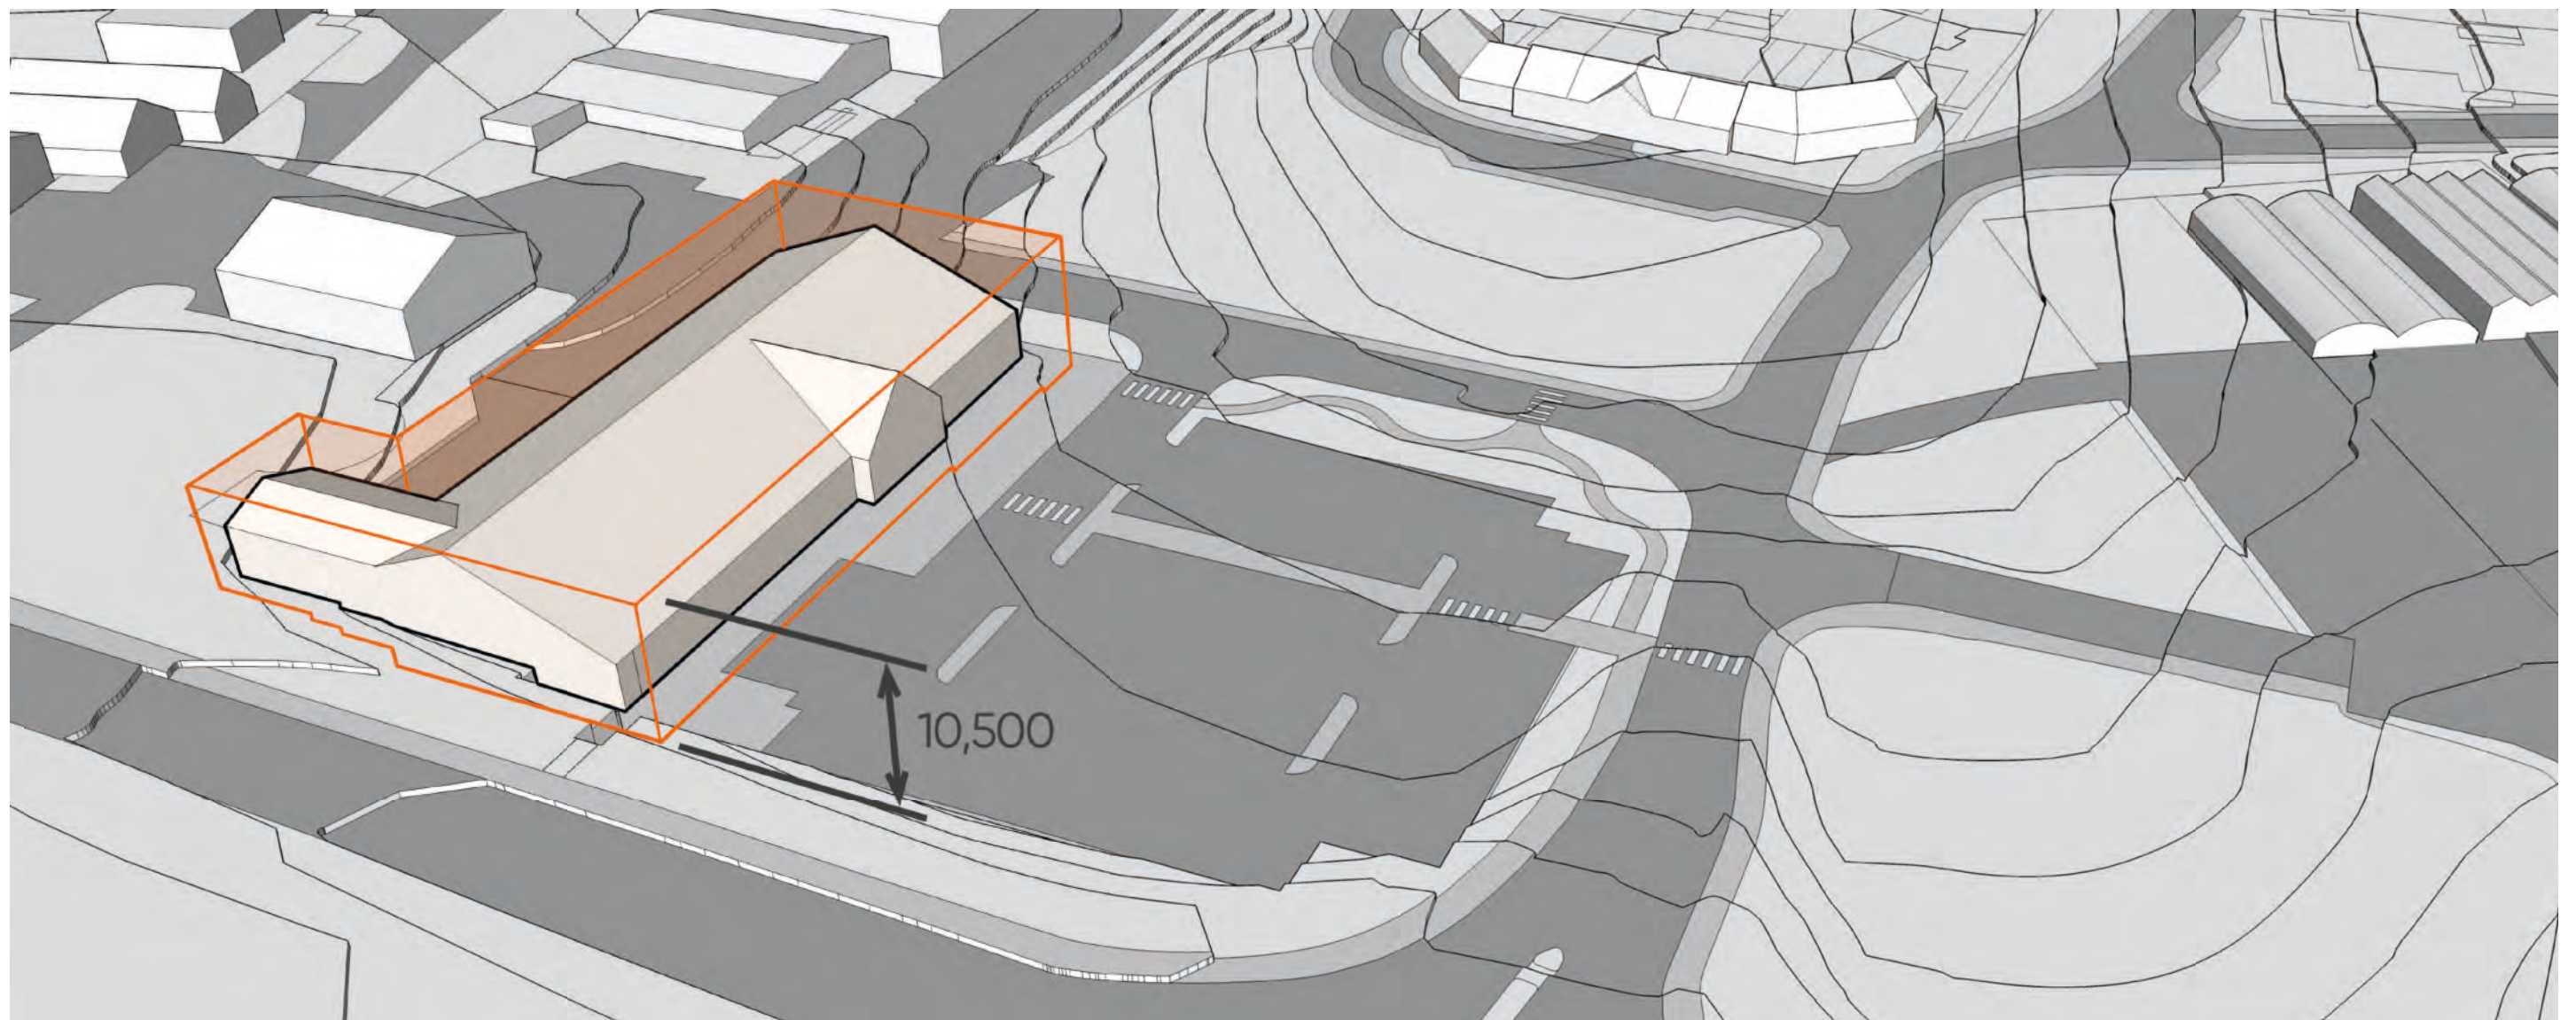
Figure N - Maximum Building Height - Above Internal Finished Floor Level
